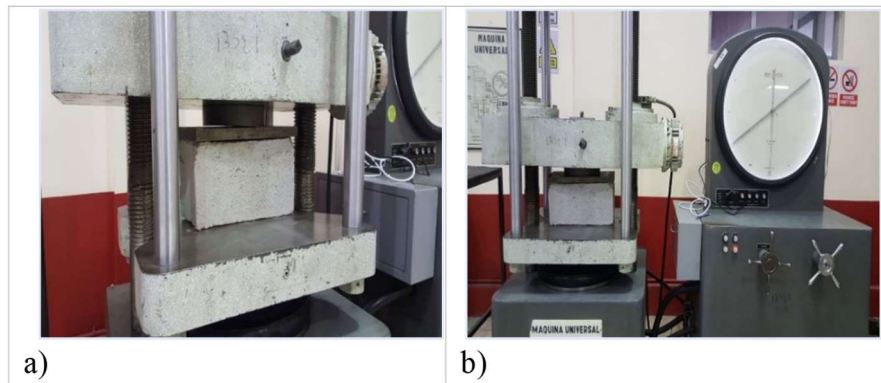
(a) Complete specimens (hollow concrete blocks) (b) Compression test on a universal testing machine.
